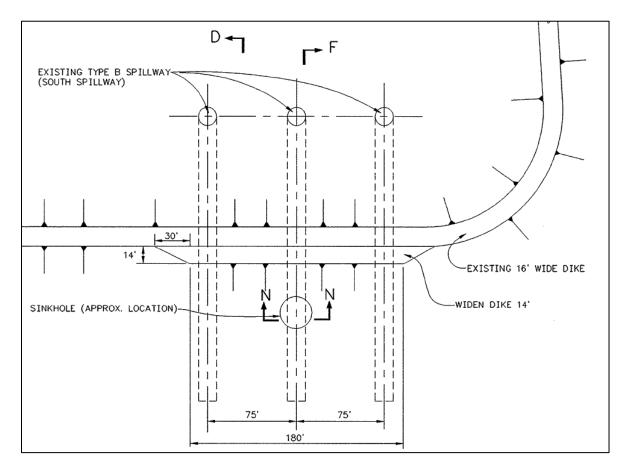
Plan View, Subsidence Feature Over South Spillway Pipe (TVA Drawing No. 10W529R6)
